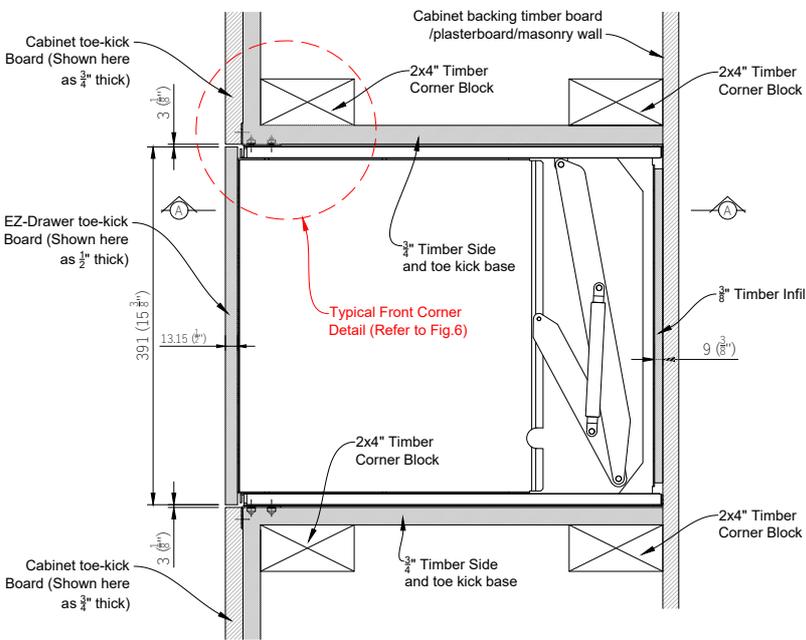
EZ-Drawer Typical Rough Opening Drawing
